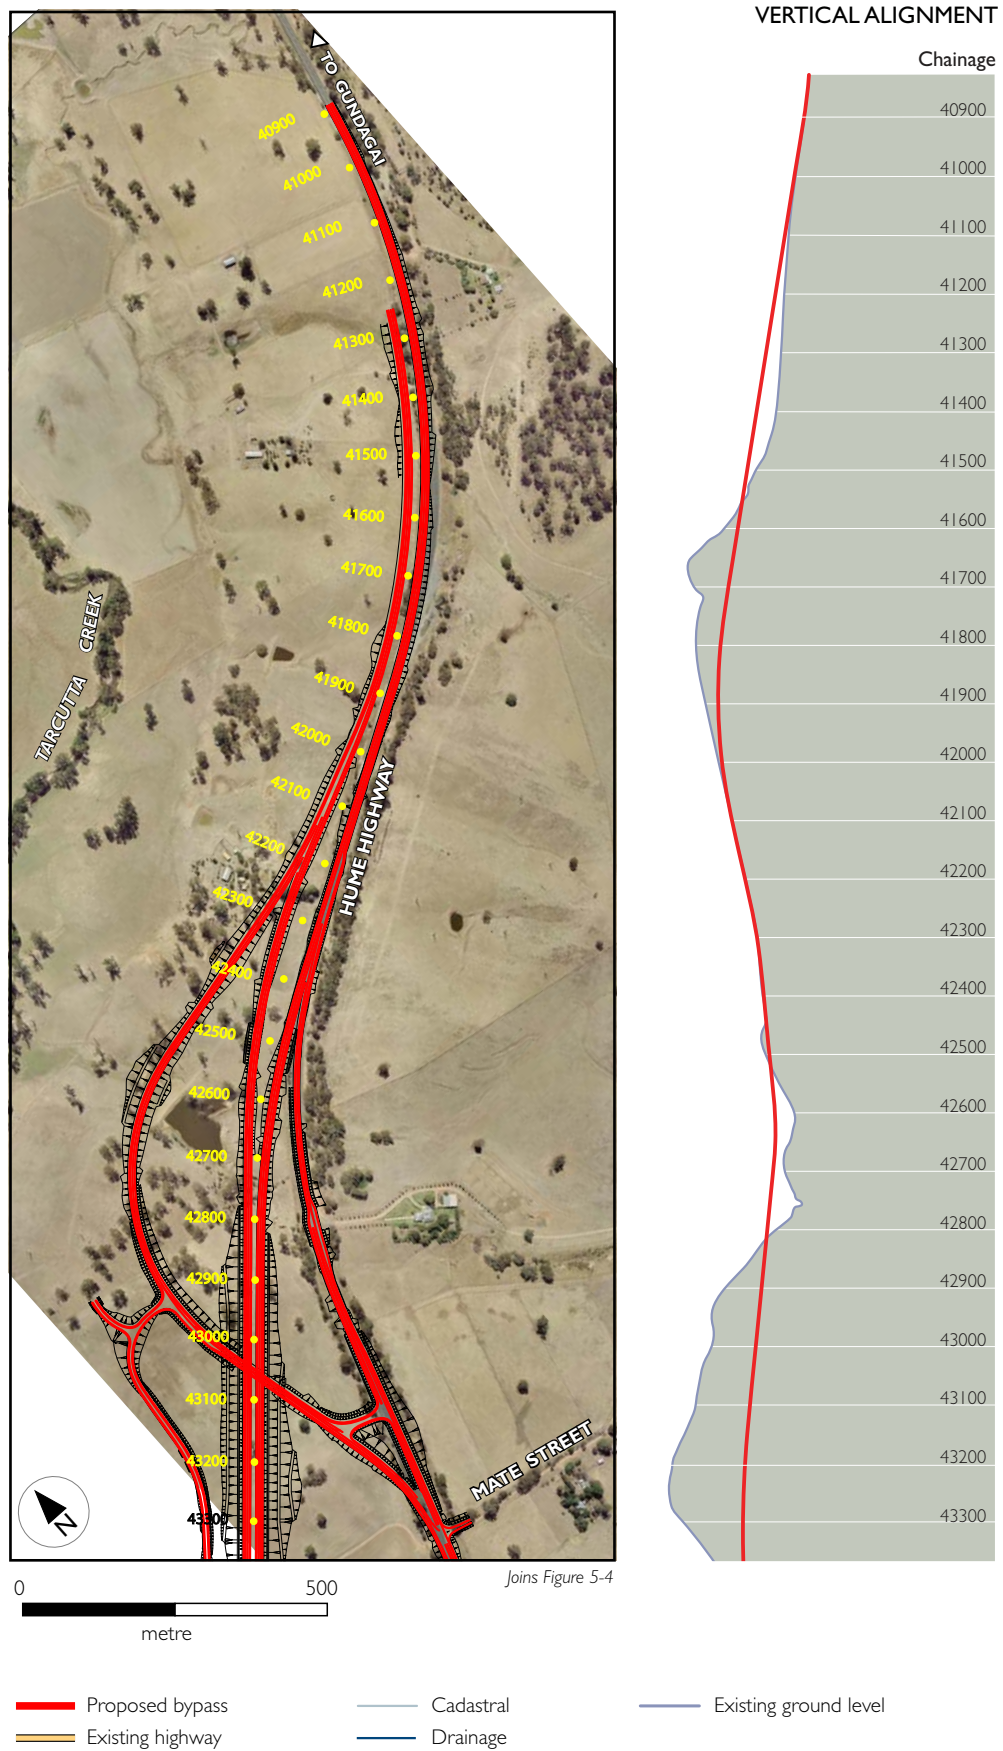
Concept design horizontal and vertical alignment (northern section)
